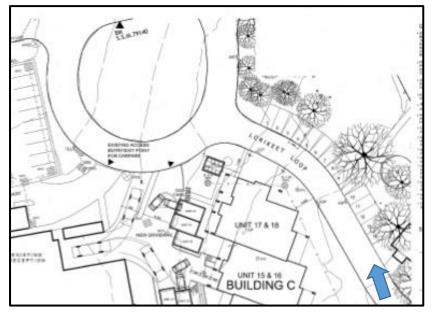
DA/924/2009B showing parking removed from central roundabout and 14 spaces approved on Lorikeet Loop
